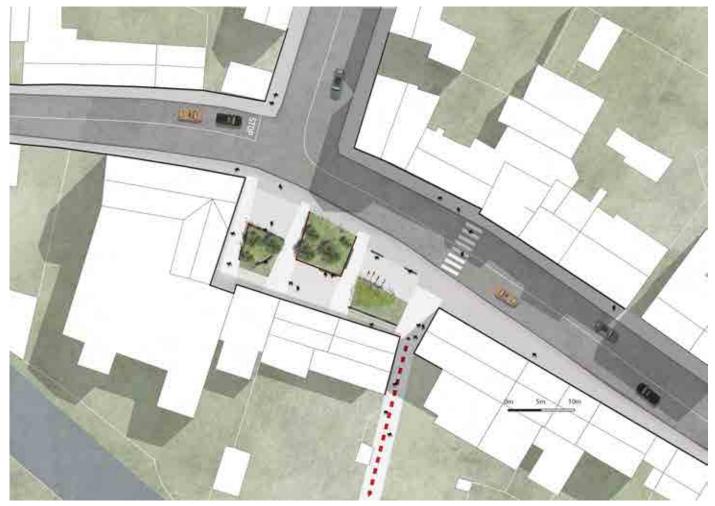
Former Co-Op Building, Active Travel Link and Civic Plaza - Future option
